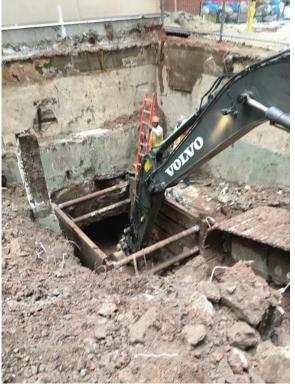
TP-2 - Final stages of excavation. Facing Northeast.
